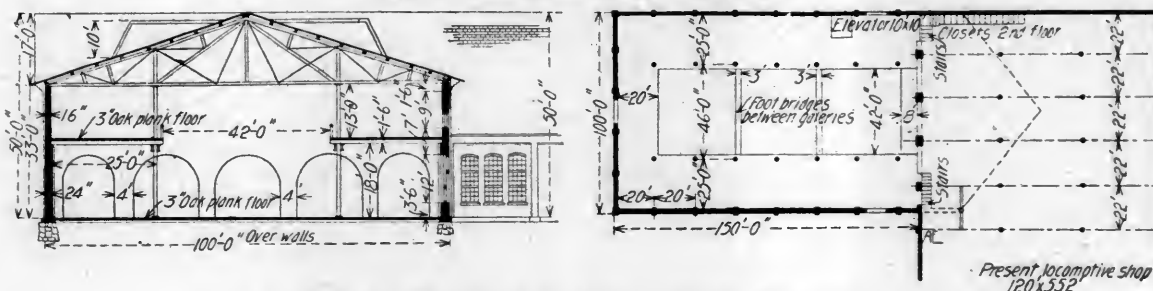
Machine Shop—Annex Plan and Sections.
